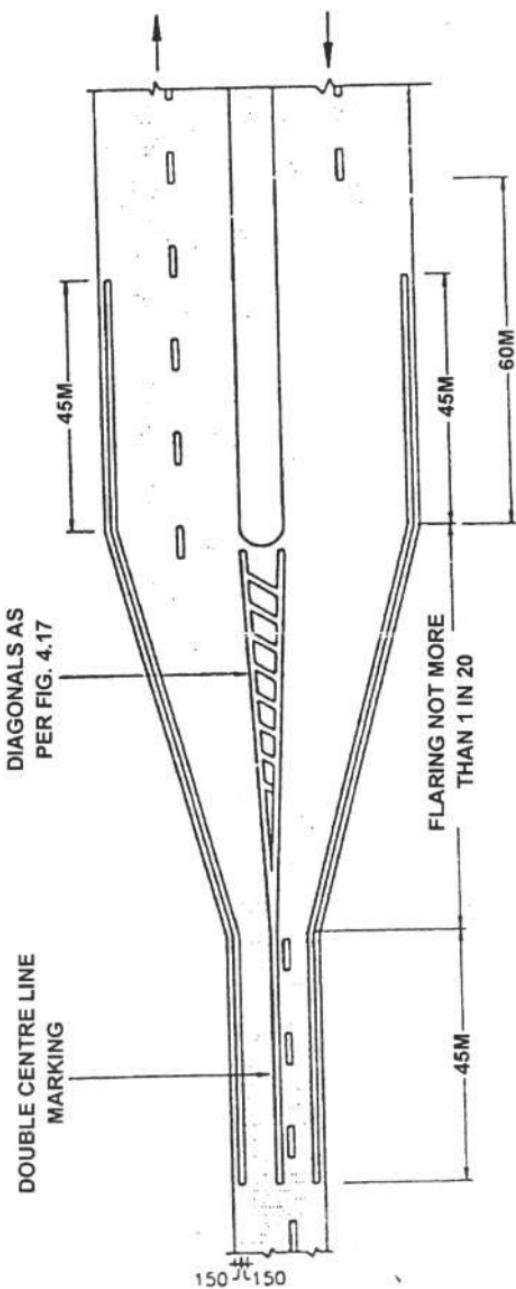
Markings on transition from 2-lane undivided carriageway (no shift in centre line)
